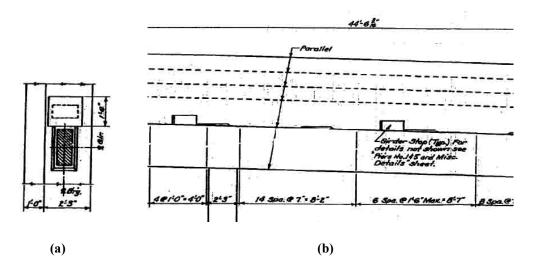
Bridge 512/19 Girder Stop : (a) Plan View and (b) Locations
